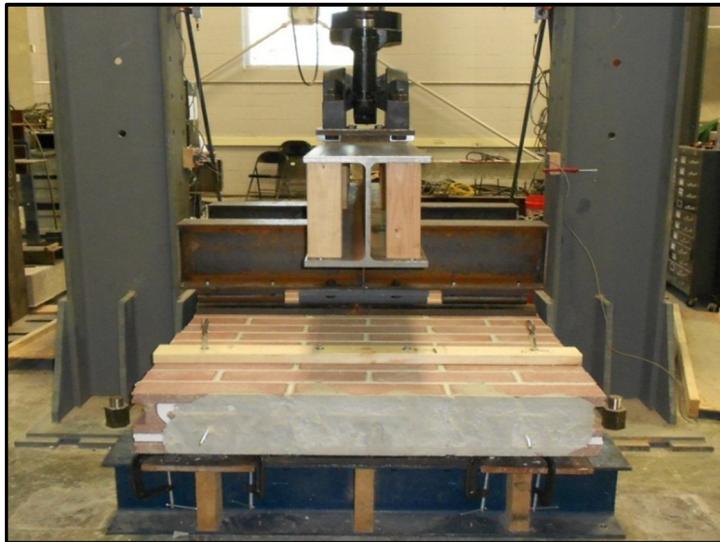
Test Setup Photograph – Viewed from End of Wall
